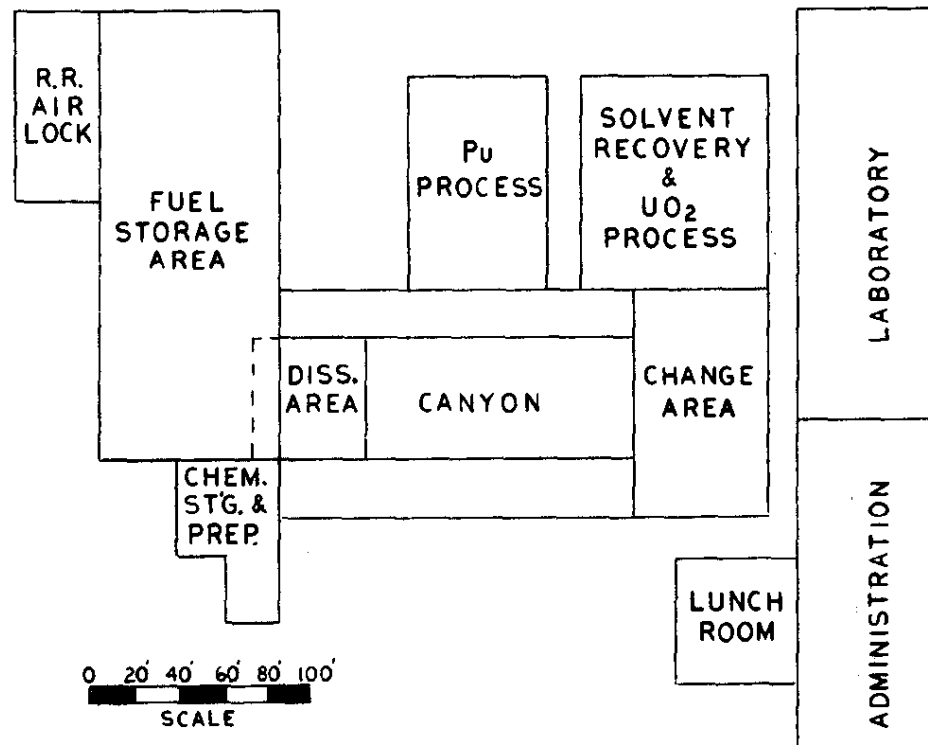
CASE VII - BUILDING NO. 13 - BUILDING ARRANGEMENT
